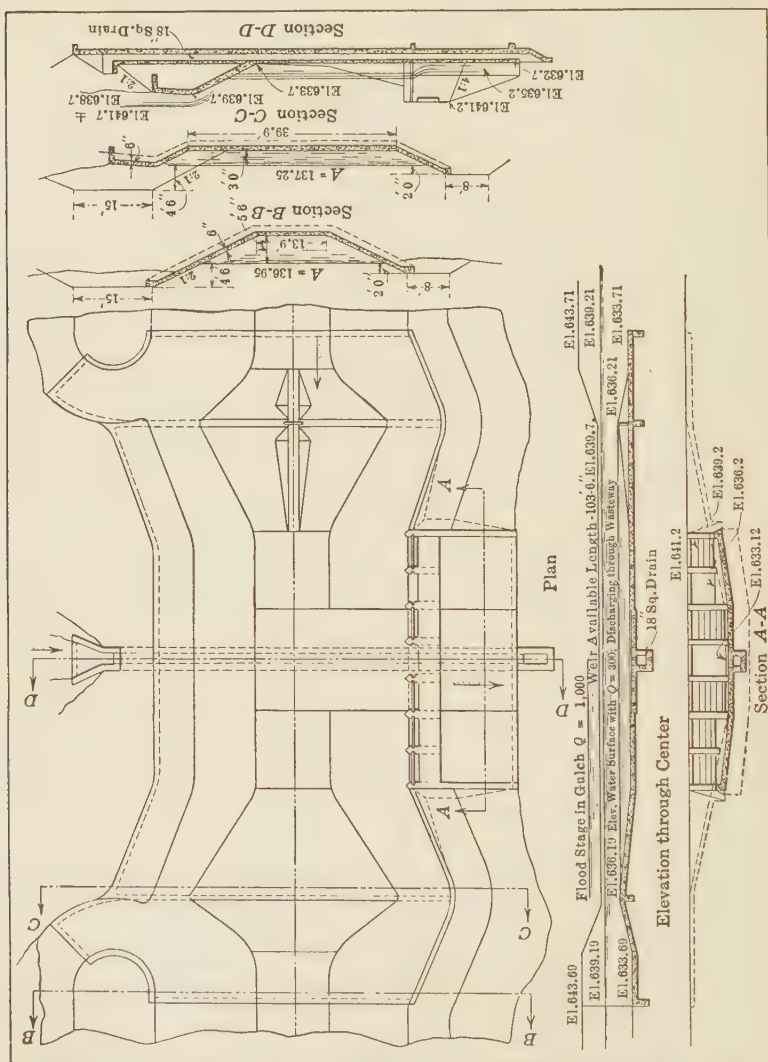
Level drainage and wasteway. Umatilla Project, Wash.
